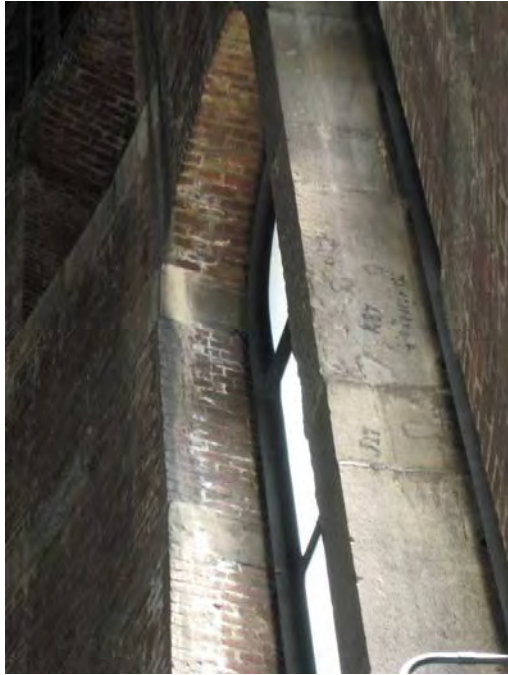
Masonry portion of the drum of the dome, showing limestone units keyed into brick masonry.
